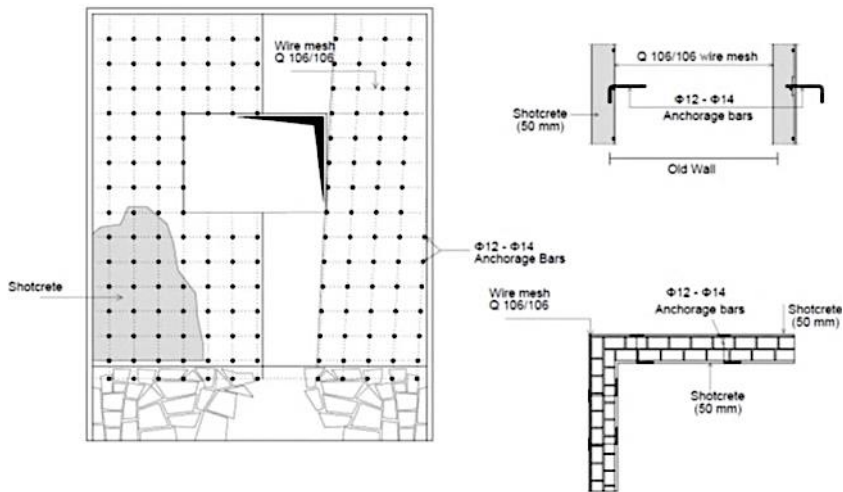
Diagram depicting the application of shotcrete. Adapted from [39]
